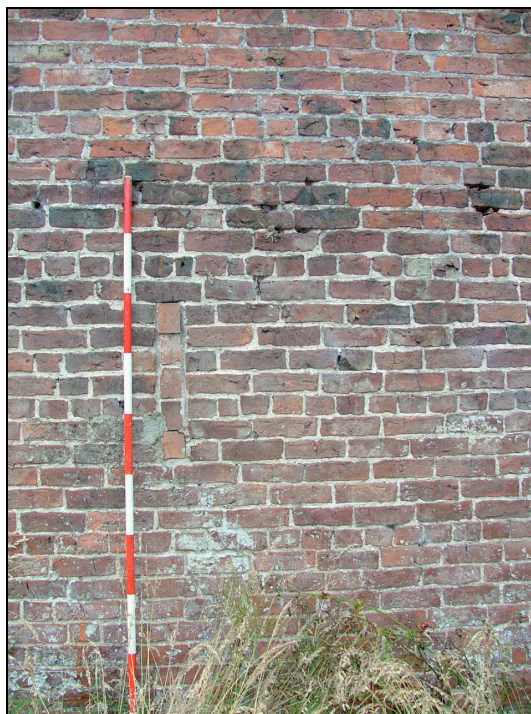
Detail of blocked ventilation slit and English garden Wall Bond brickwork, east elevation of Building 1 (Scale is in 20cm graduations)
